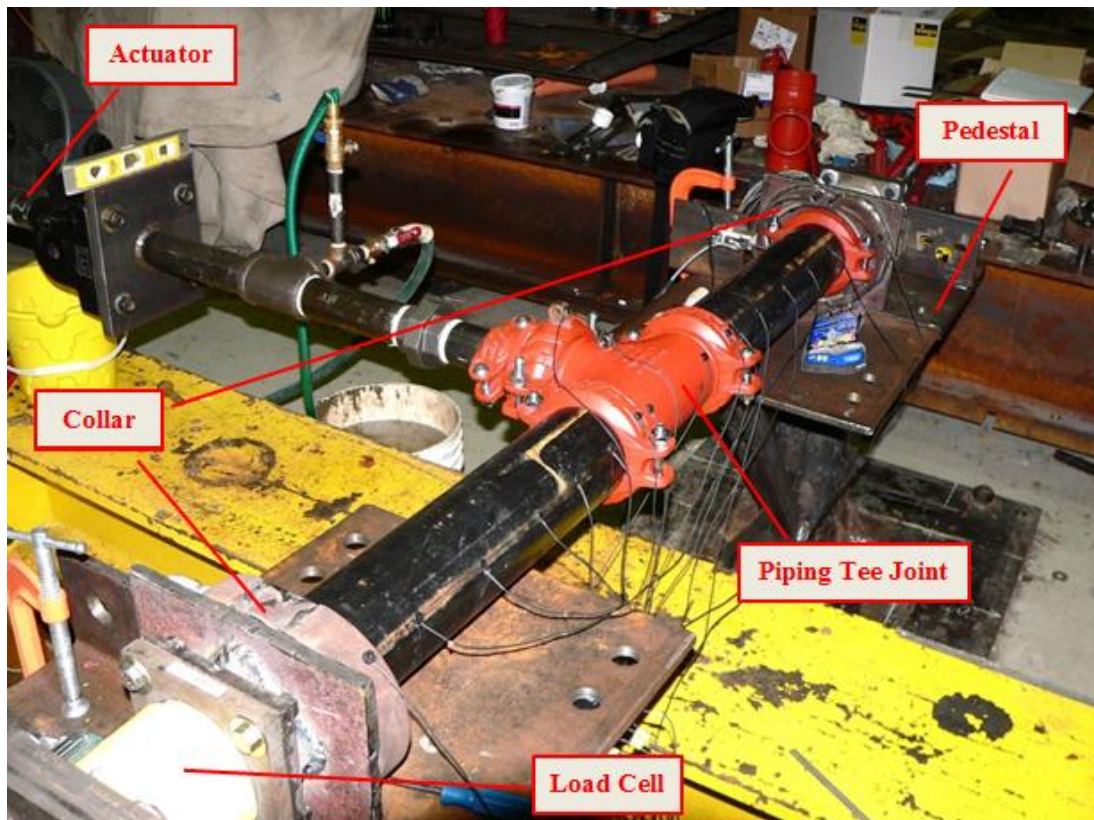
Specimen made of steel pipe with groove-fit connections
